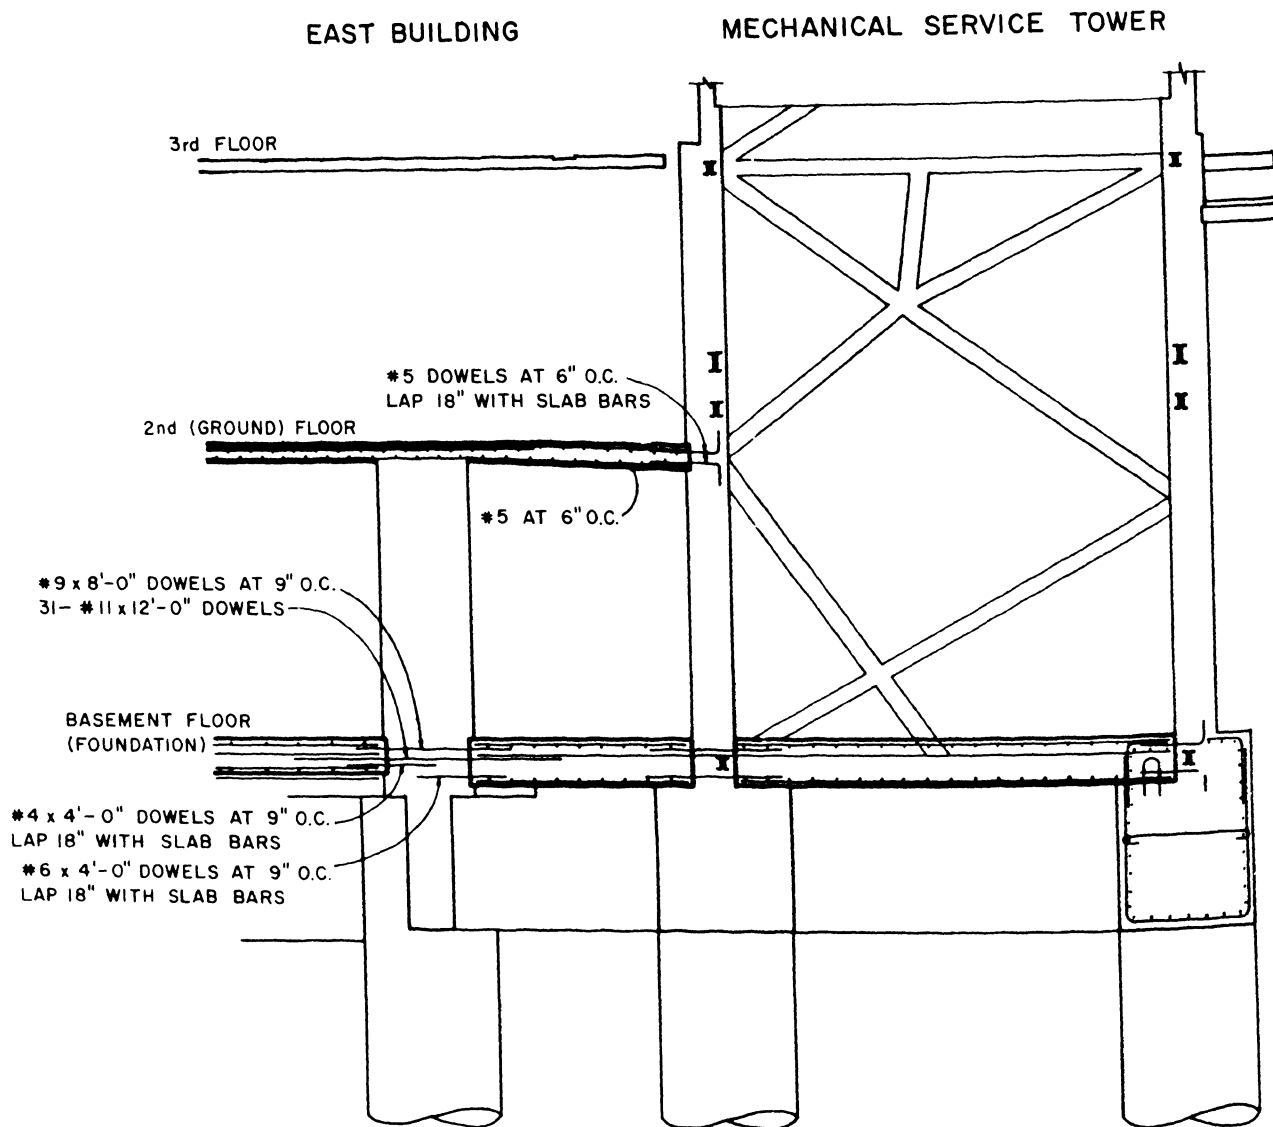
REINFORCED CONCRETE CAISSONS, COLUMNS, WALLS, BEAMS AND SLABS BETWEEN EAST BUILDING AND SERVICE TOWER
